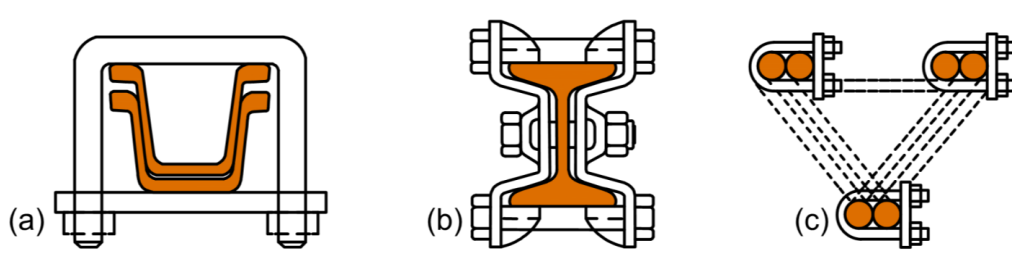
Sliding connections of (a) top hat section steel sets; (b) H section steel sets and (c) lattice girders.
